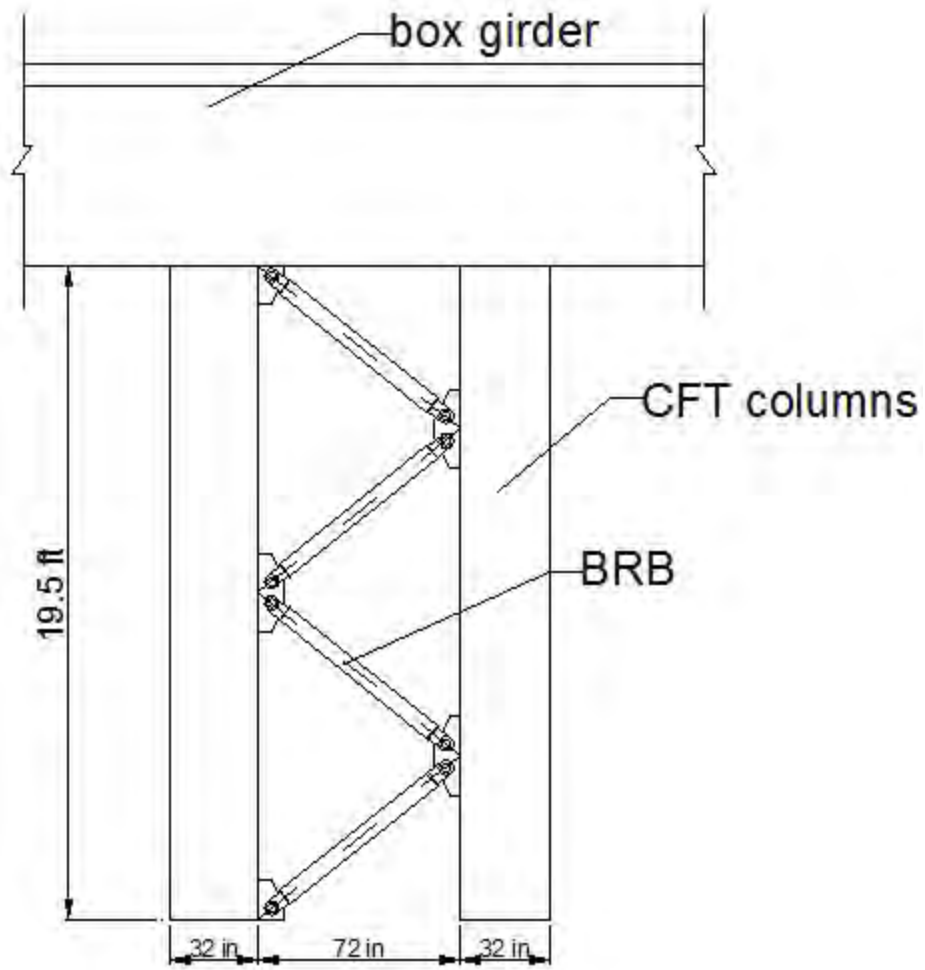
The elevation view of the bridge bent in the longitudinal direction with inserted BRBs
